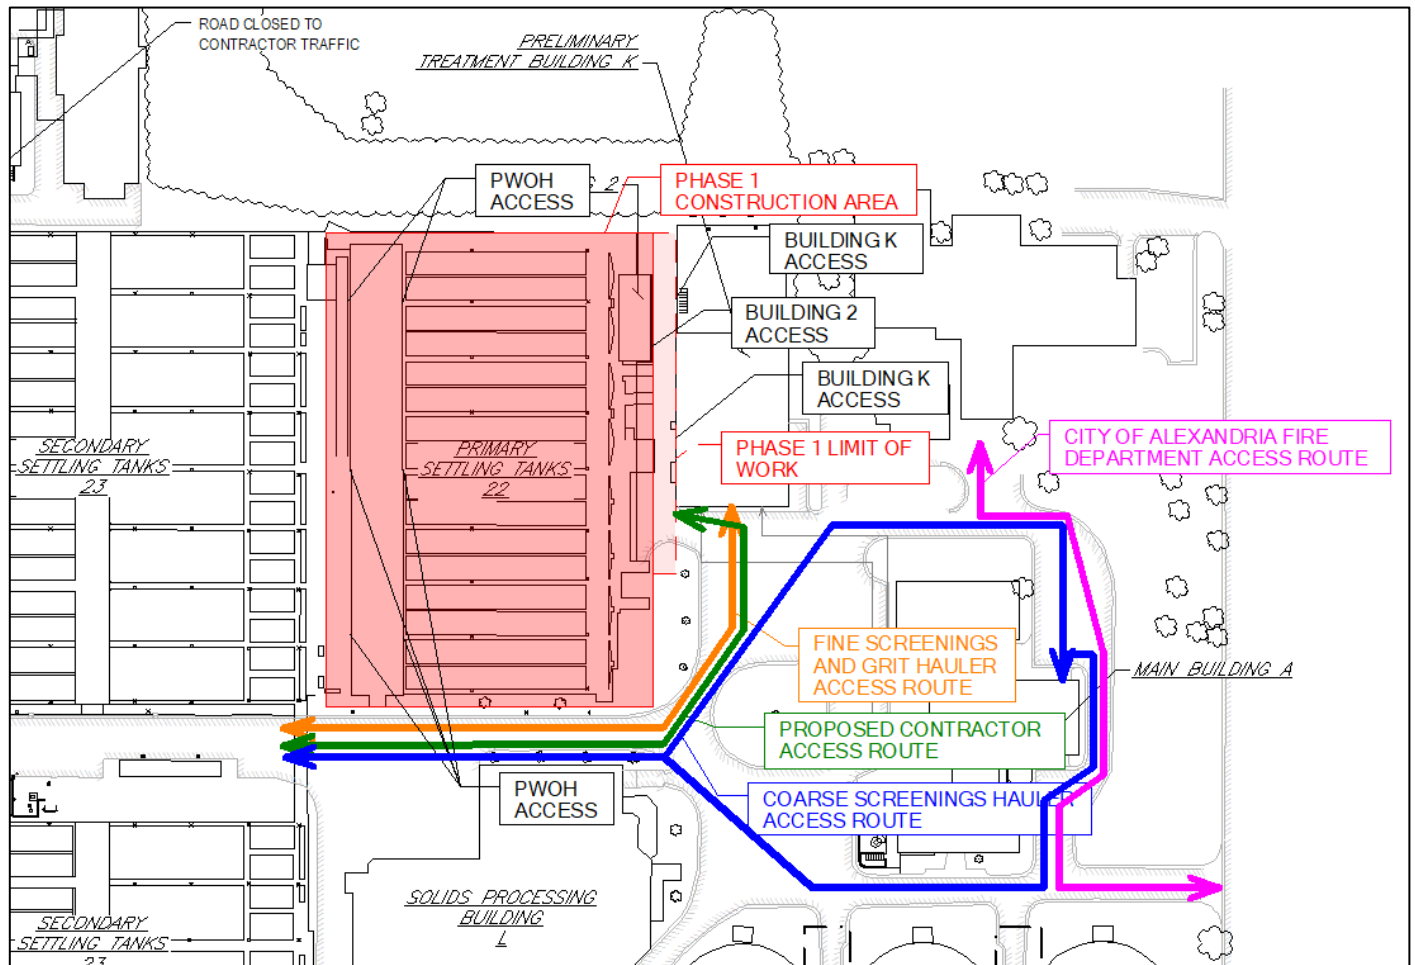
Partial Site Plan of Phase 1 Construction Impacts
